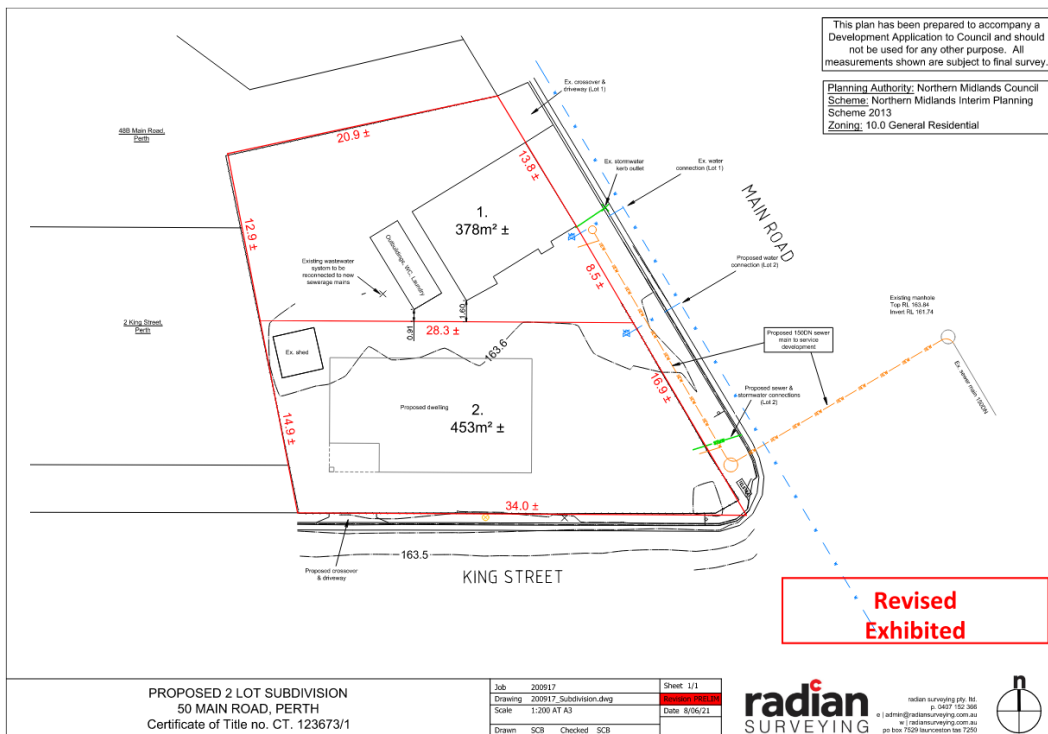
Subdivision plan revised after discussion with heritage advisers
